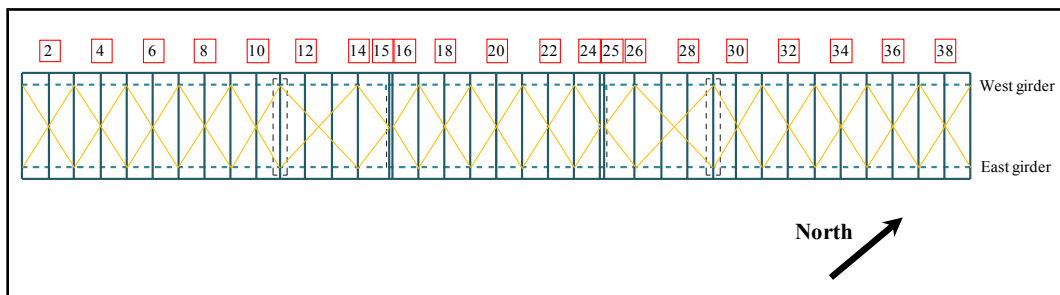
Floor beam numbering and plan view of the top lateral system
